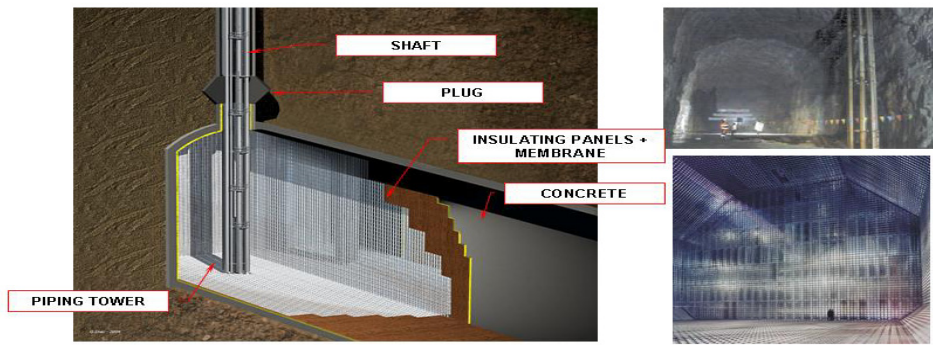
Typical cavern equipment arrangement (with pictures of LPG cavern storage and membrane tank of LNG carrier)
